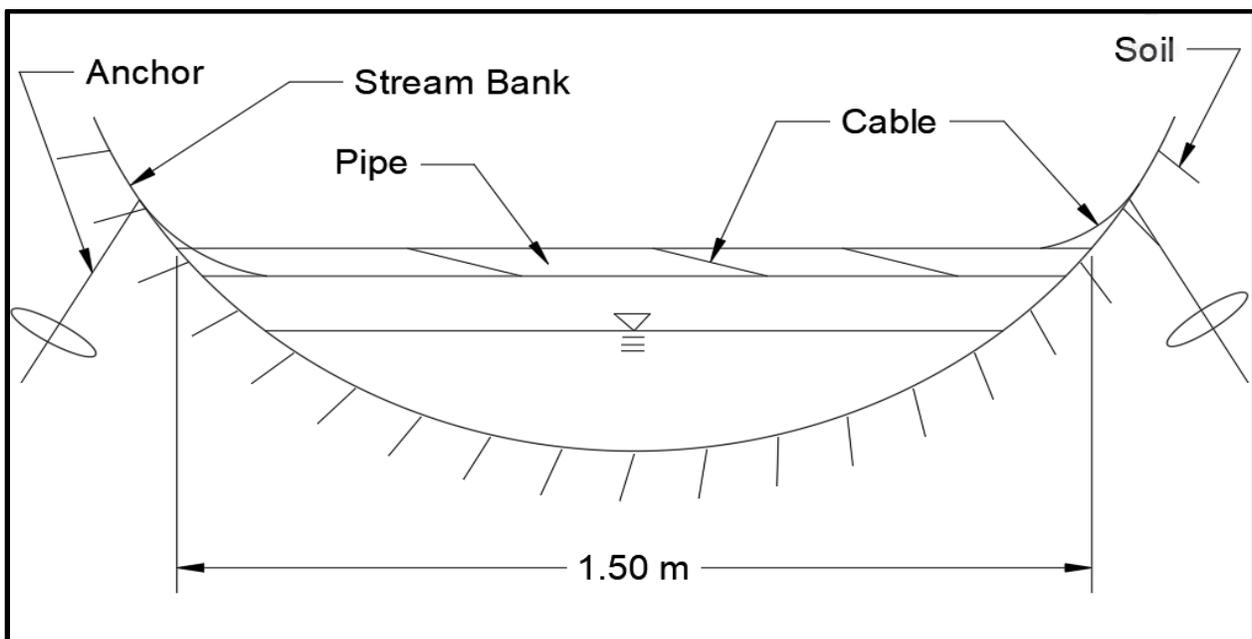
Design of stream crossings with ground anchors (Image to scale, dimension in meters)
